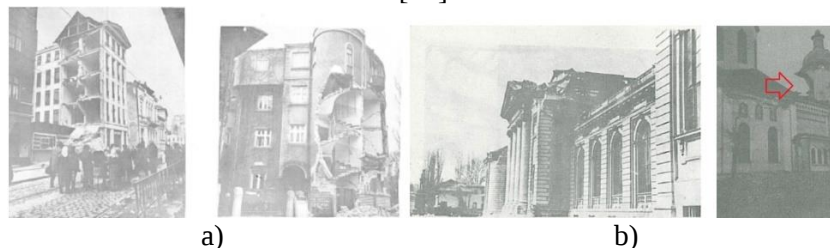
a) facade wall completely collapsed; b) wall of the staircase, completely collapsed;
